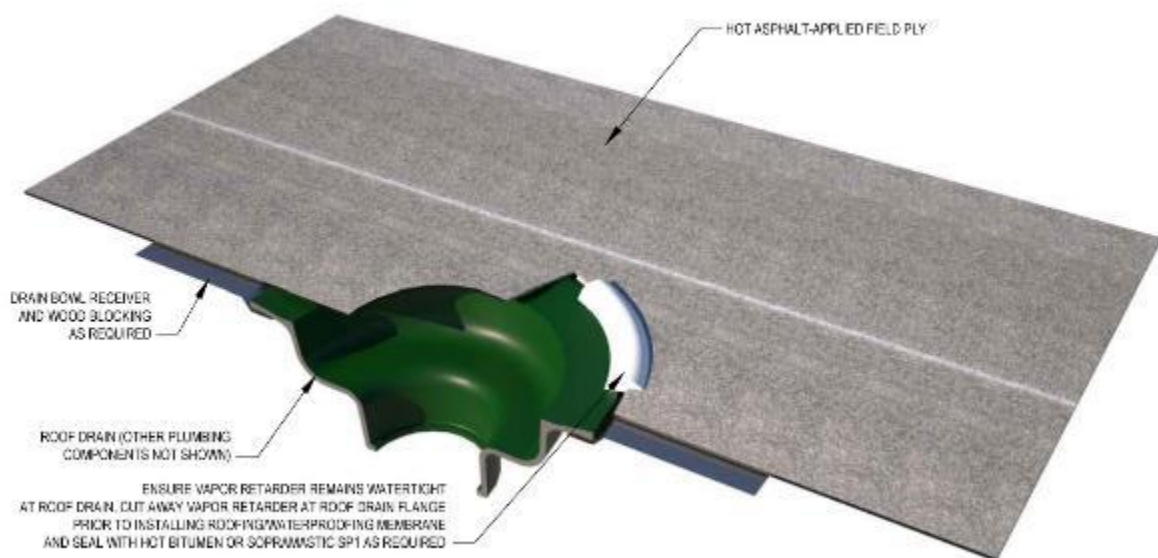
Hot Asphalt-Applied Vapor Retarder at Roof Drain
